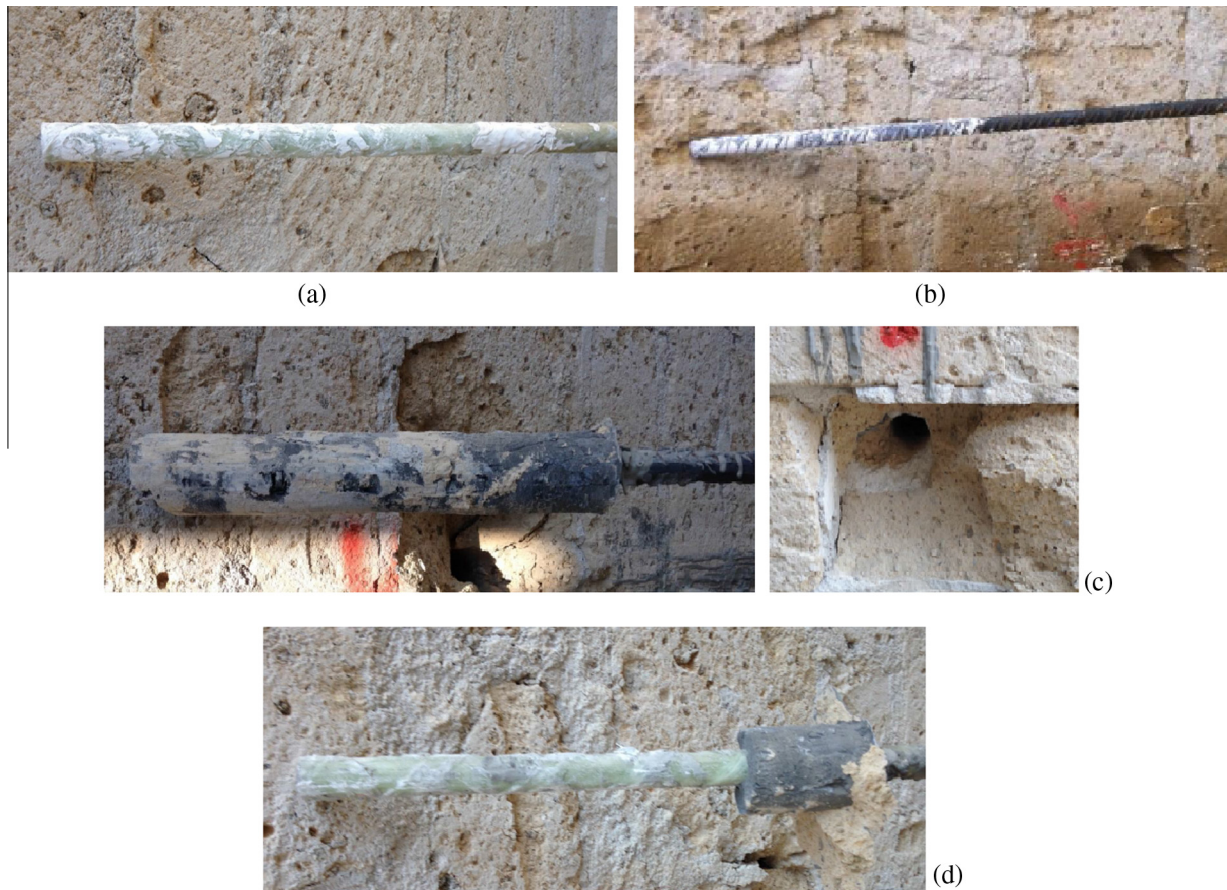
Typical failure modes observed in series 2: a) Bar/Grout (B/G) interface failure for GFRP bar in P-based grout; b) Bar/Grout (B/G) interface failure for steel bar in P-based grout; c) Grout/Masonry (G/M) interface failure with the Masonry Cone Detachment (MCD) for steel bar in C-based grout; d) mixed Bar/Grout and Grout/Masonry interface failures with partial Masonry Cone Detachment (B/G + G/M + MCD) for GFRP bar in C-based grout.
